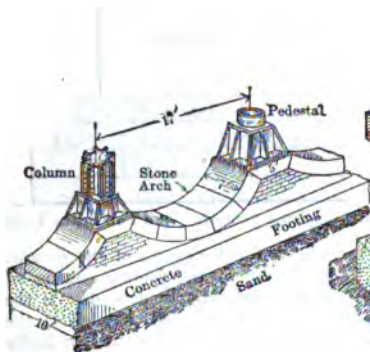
Inverted-arch Footing. Drexel Building, Philadelphia
